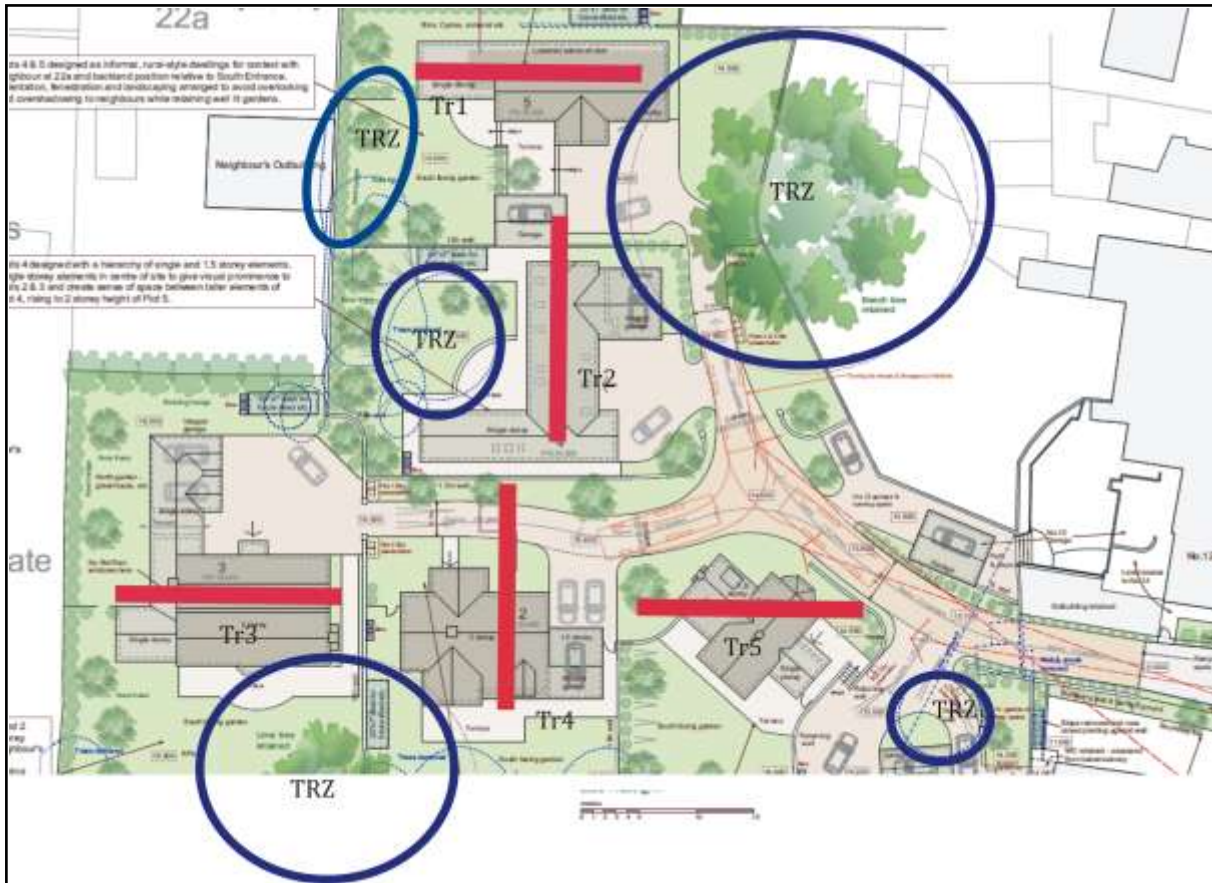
Trench location plan (TRZ: Tree Root Protection Zones)
